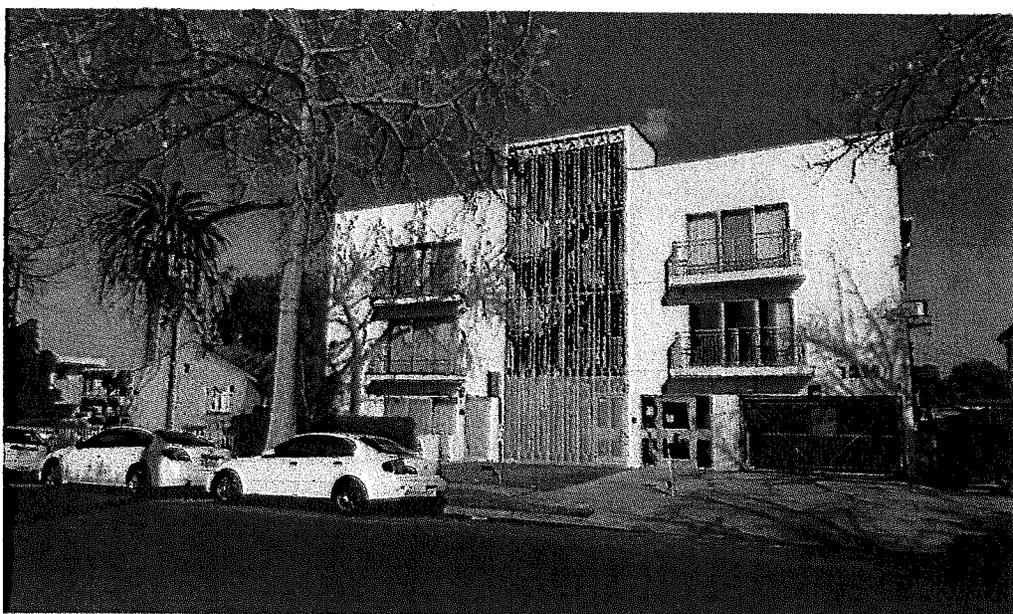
D: 1219 W. 27th Street, south façade, November 2015 (HRG)
